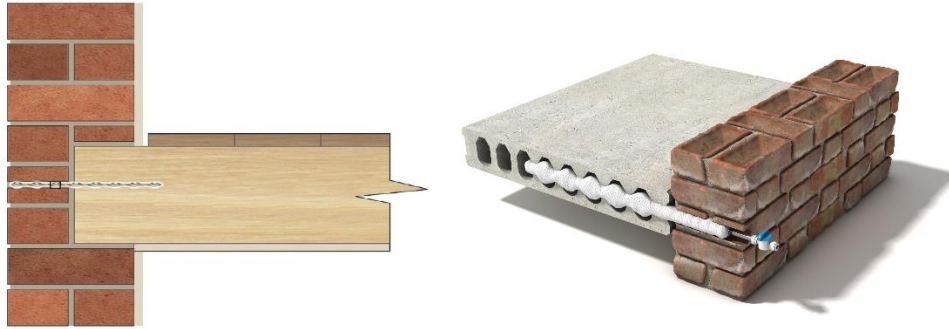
Brickwork façade restrained from bowing out of plane and heavy duty repair to masonry façade.
